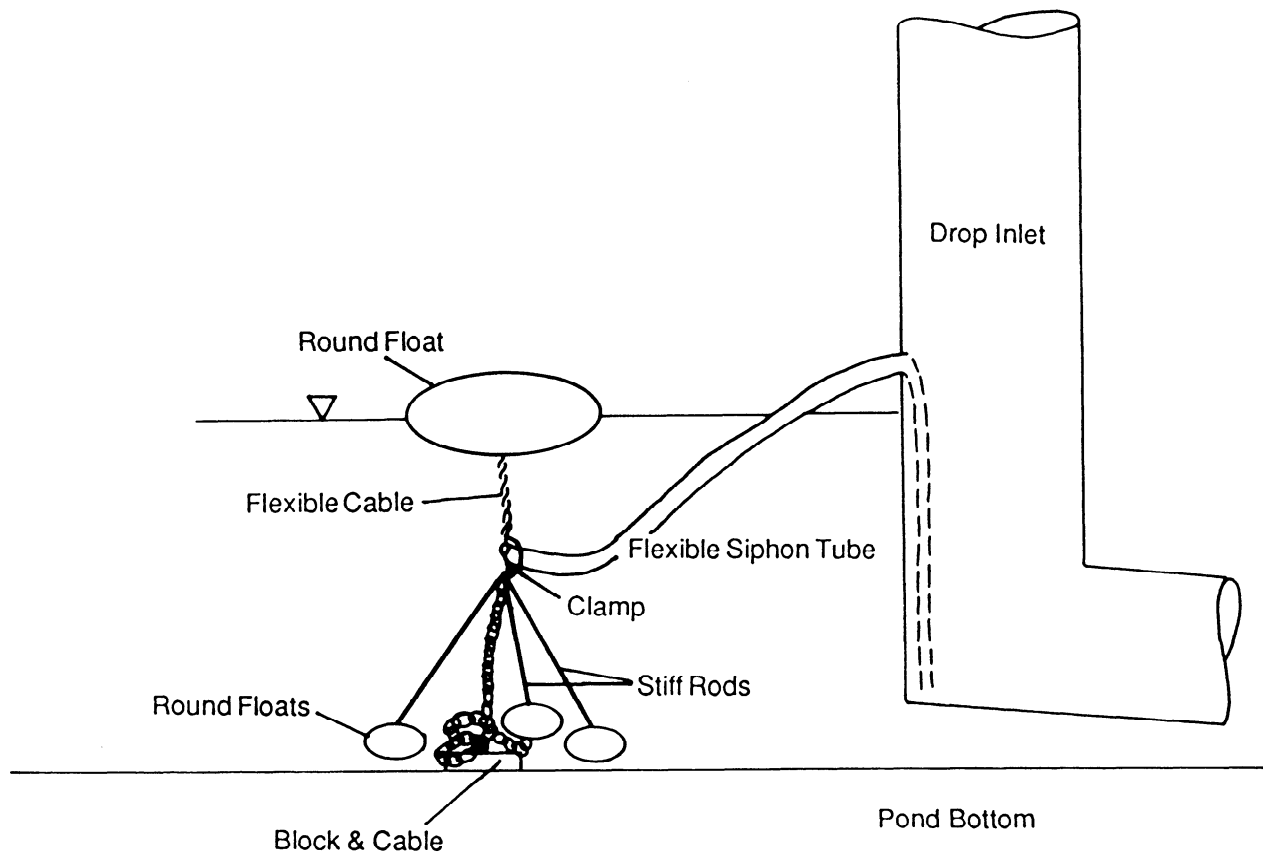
Schematic of floating siphon tube used for dewatering.
